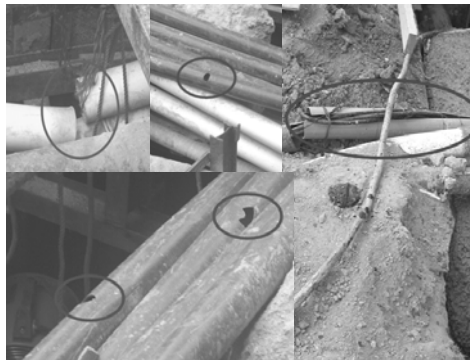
Typical cracks or holes in PVC ducts caused by roadwork which provide passage for the ingress of gas into manholes
